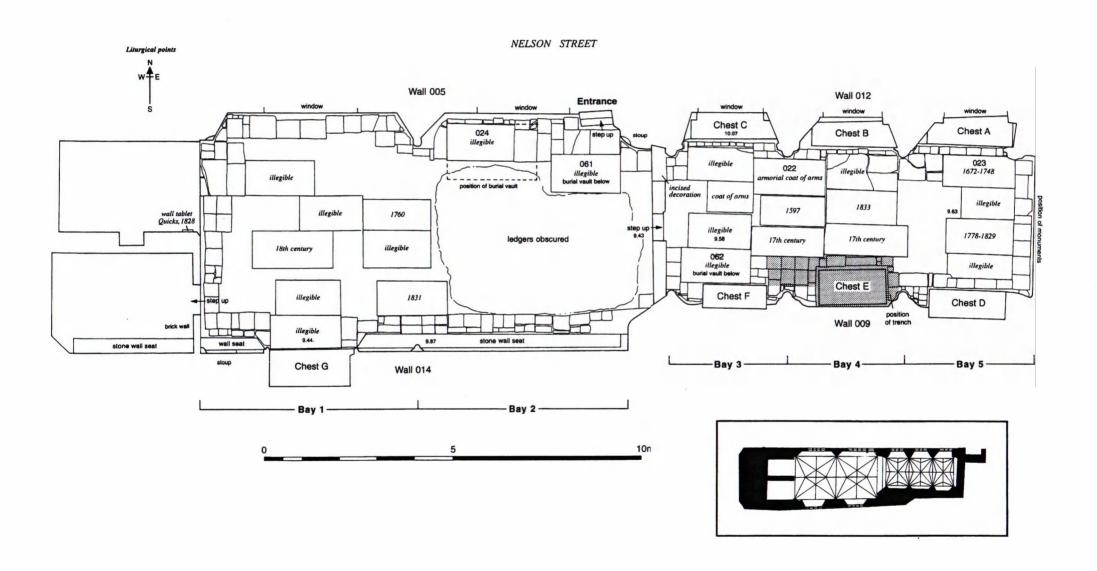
Plan of the Crypt (BaRAS 1998) with inset based on 1942 RCHM survey showing ceiling vaulting
